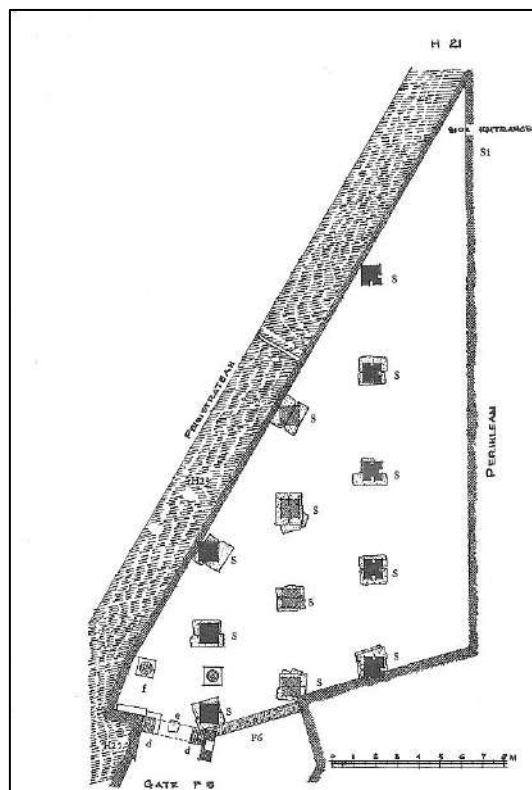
Plan of Triangular building (Gate F5 and storage building). Source: Mylonas (2009, plate 36).
